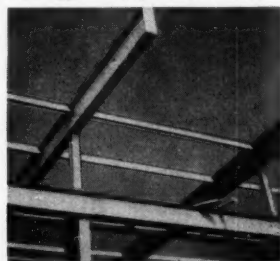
Simpler Erection Cantilevered ends of roof girders project out from 50' and 70' bays and over the 85' bay are ready to receive the 30' girder to complete the 85' span.
